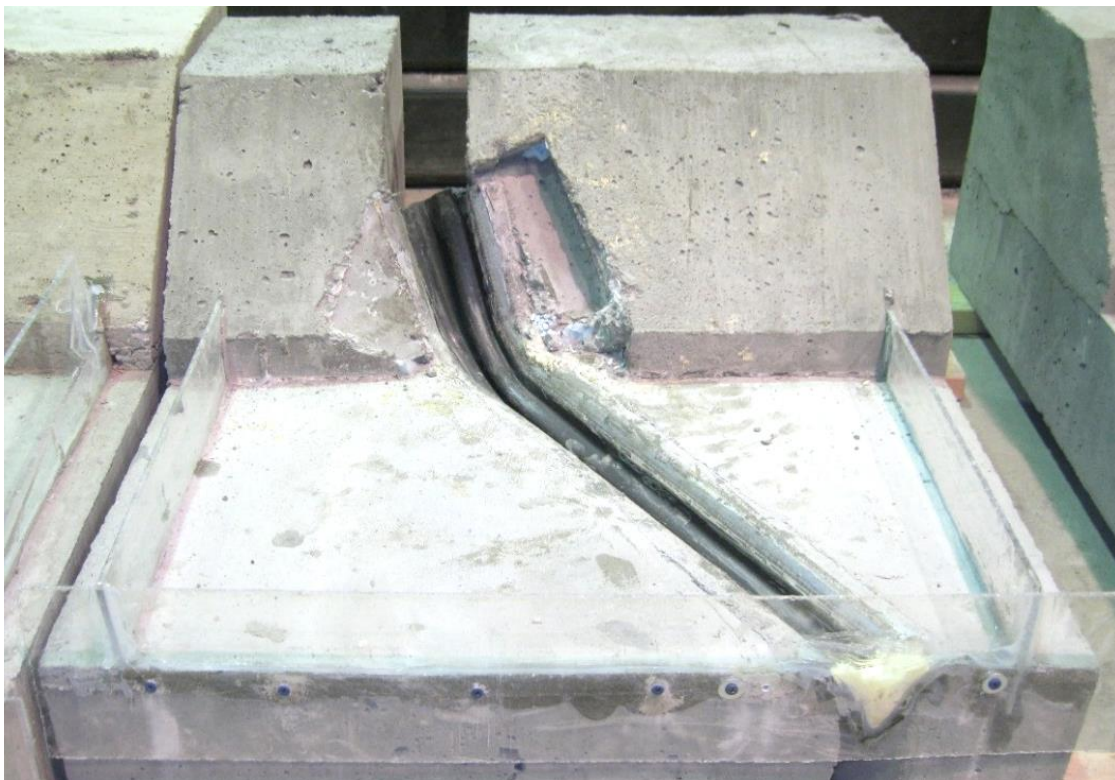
Turn-up specimen with blockout formed using blue insulation board
